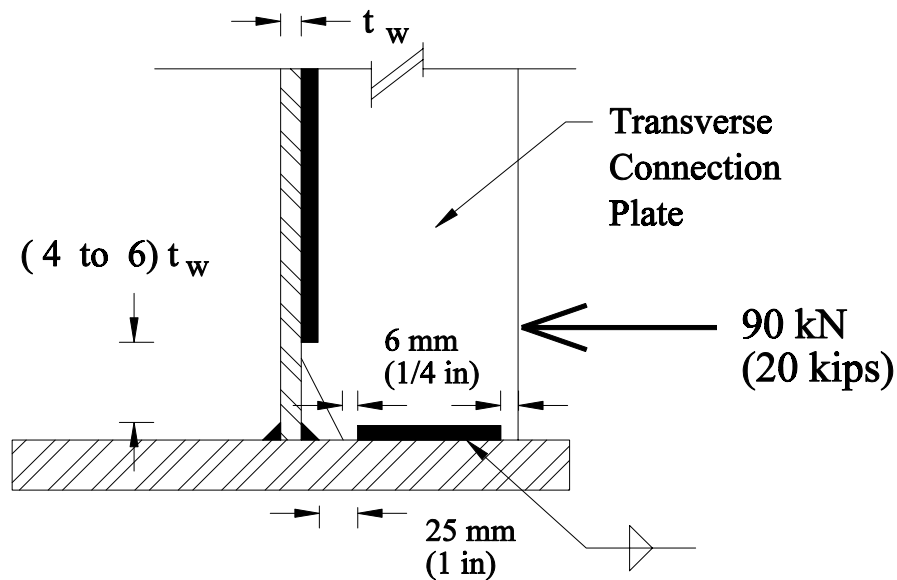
Design criteria for welded attachment of connection plate.
